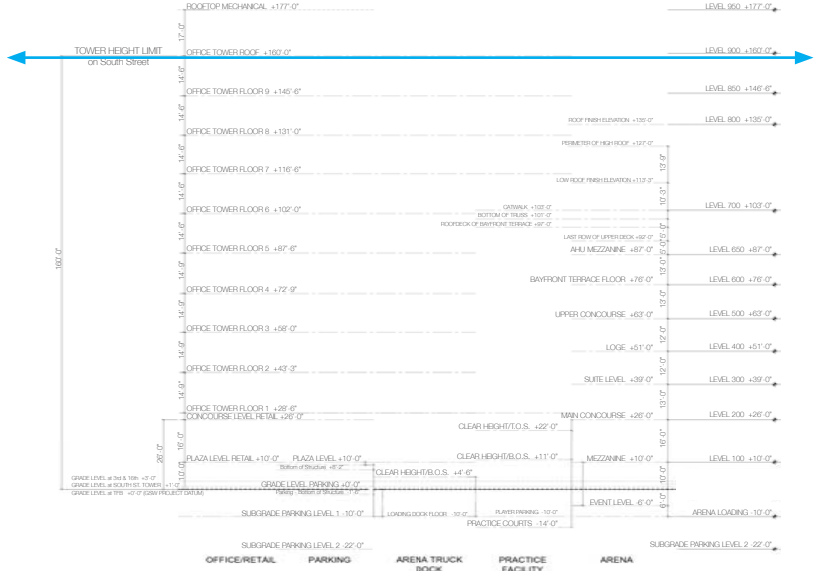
Mixed-Use Tower Roof: Maximum office/lab tower height will be +160'0" consistent with the Redevelopment Plan
